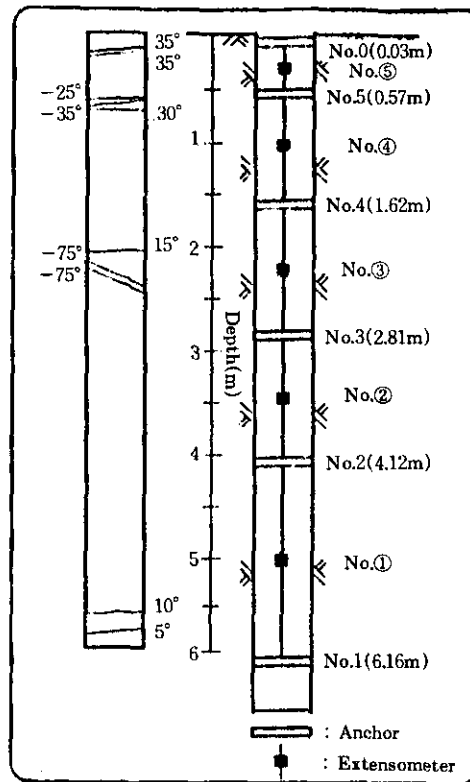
Rock condition at test site and arrangement of extensometers and anchors.
